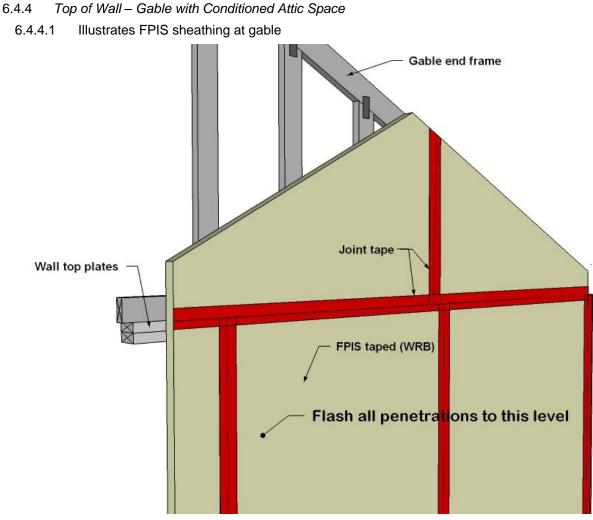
Top of Wall at Gable End with Gable End Frame Sheathed with FPIS Continuous from Wall Below (Note: Bracing is not shown.)
